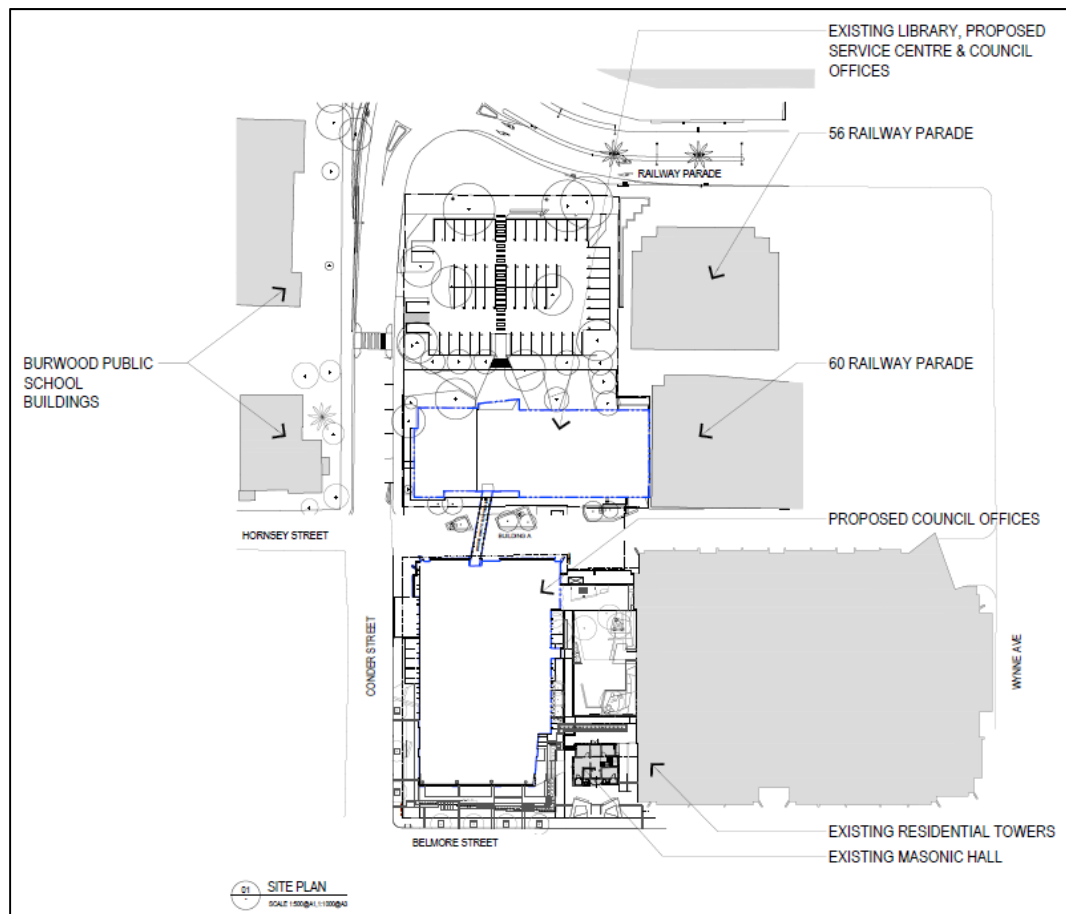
Site Plan, Drawing No. G-DA-01 prepared by DesignInc
